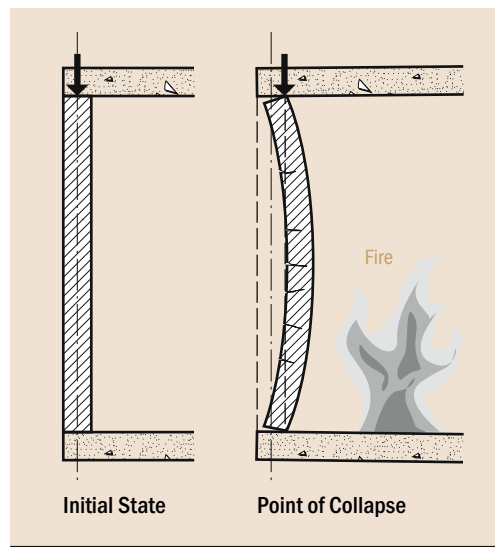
Collapse Mechanism of Concrete Masonry Wall Subject to Fire
